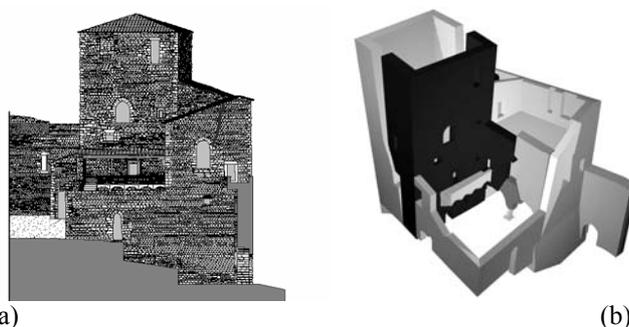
(a) Cracking on WallA2; (b) Reconstruction of general displacements
